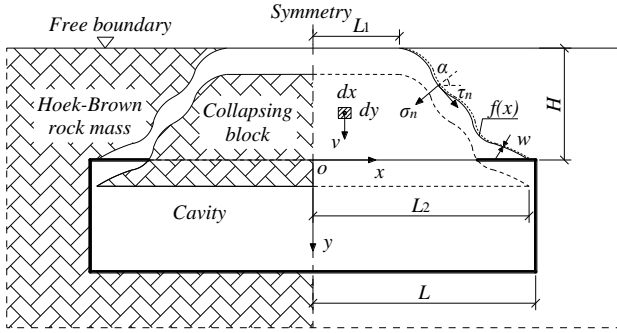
Collapse mechanism of shallow tunnel (Yang and Huang 2011)
